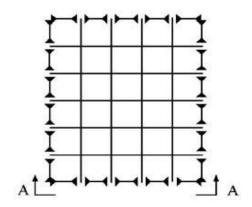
Plan of Twenty storey benchmark building, (Y.Ohtori et al., 2004)
